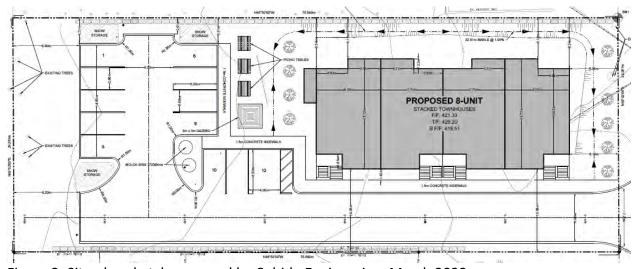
Site plan sketch prepared by Cobide Engineering, March 2023
